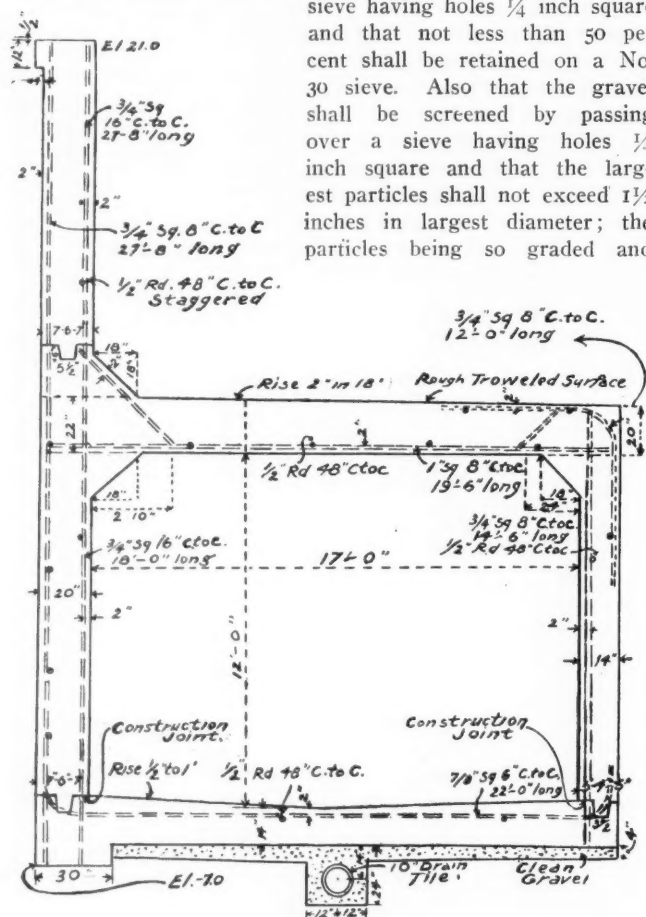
RIVER WALL SECTION AT PUMPING STATION
